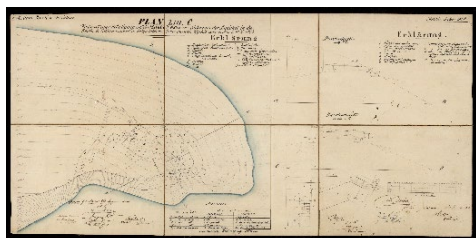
Drawing C – Fort Oštro, 1850. (HDA)
